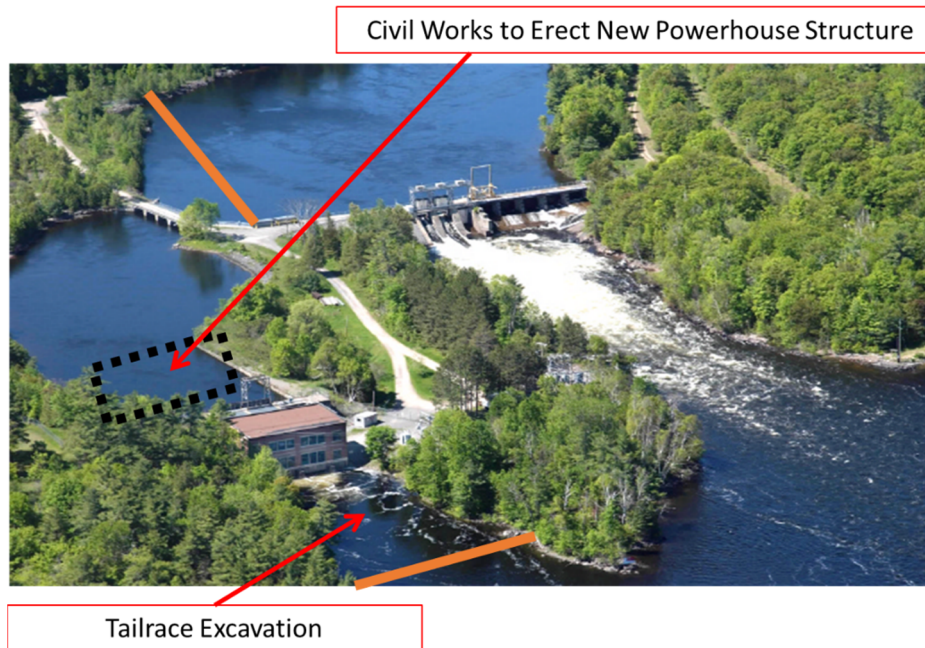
Work Sequence – Stage #2 – Powerhouse Demolition and Excavation of New Powerhouse
